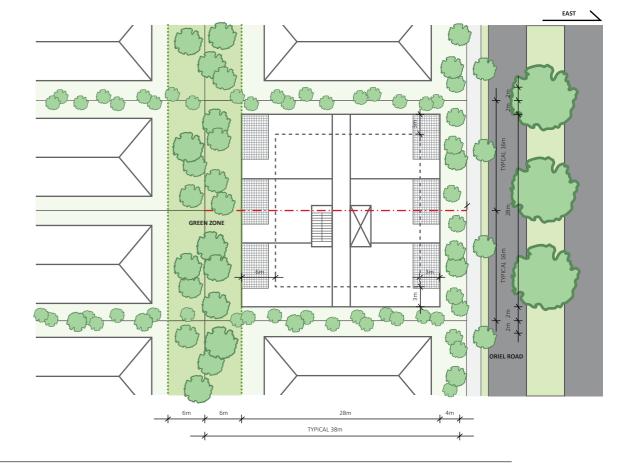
Typical Upper Floor Plan - Main Roads with two lots consolidated
